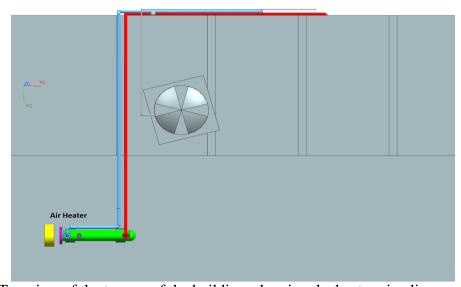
Top view of the terrace of the building, showing the heater pipe line connections
